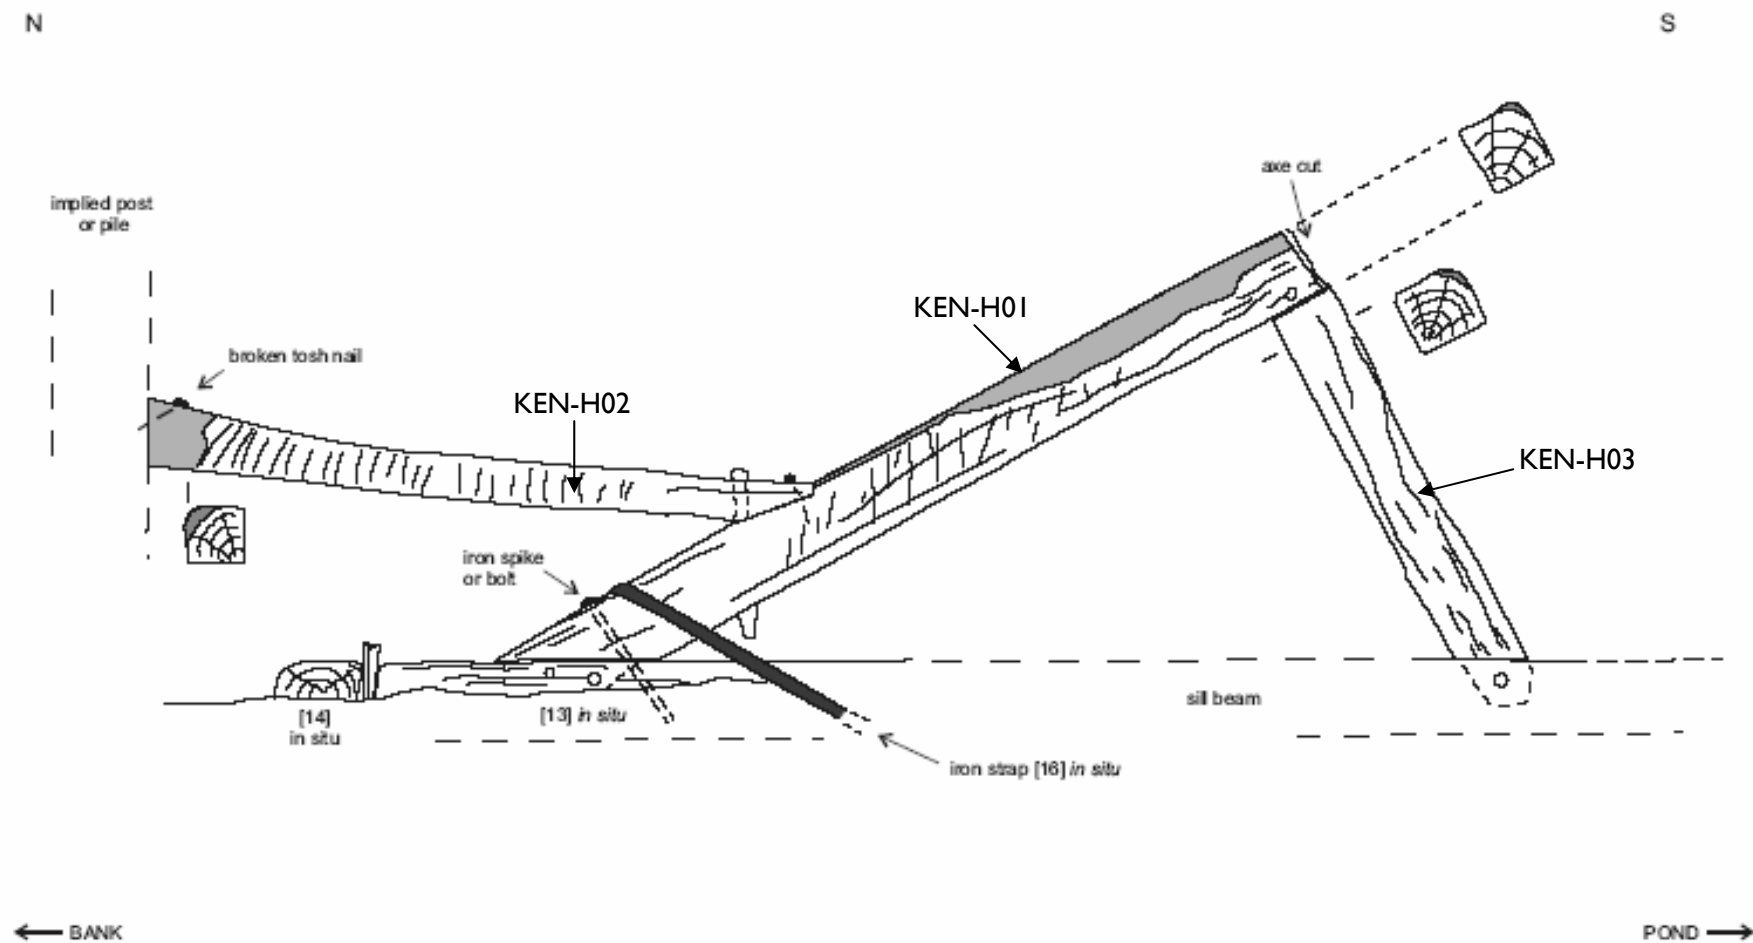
Reconstructed elevation of refitting timbers, forming 'Assembly A': part of a truss-like structure, showing the location of samples KEN-H01–3 (Elsden and Goodburn 2006)
